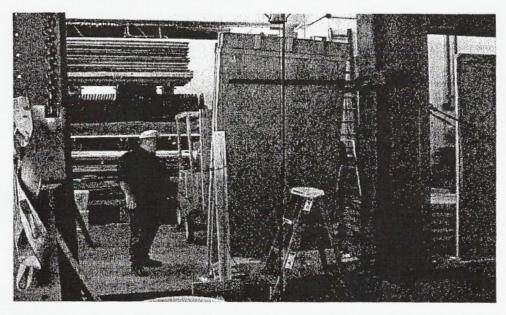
Failure of 8' OSB-OSB Panel Under Compressive Loading
